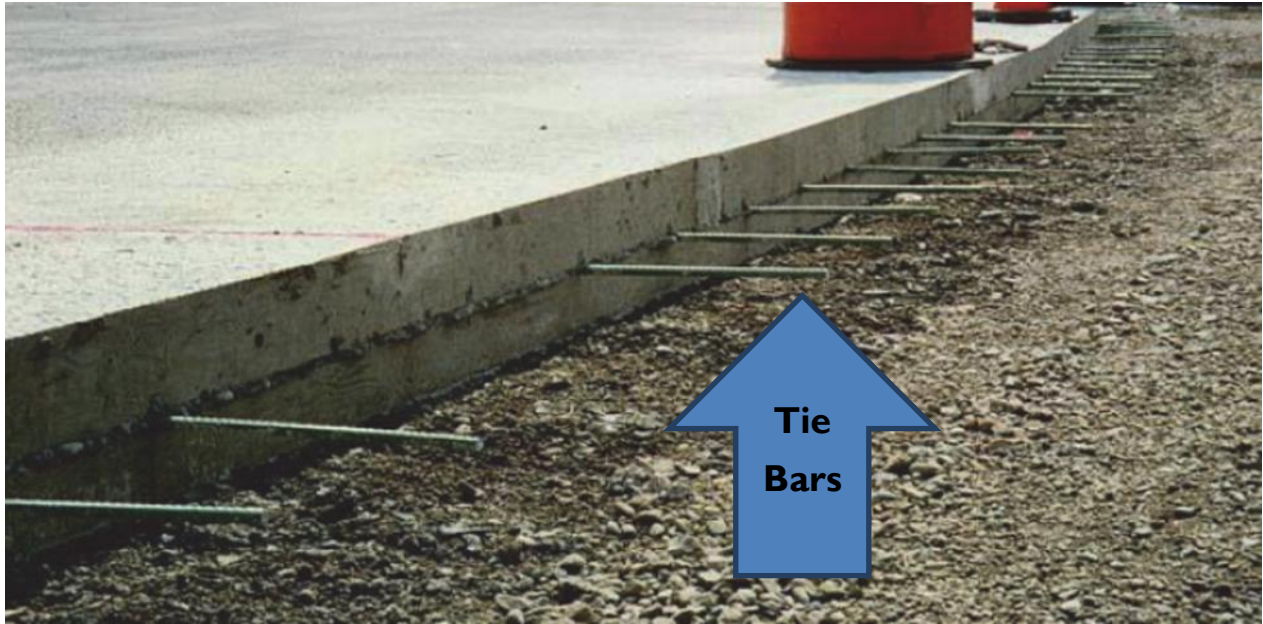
Tie bars in place to connect to parallel concrete slab (ERA PDM-2013)
